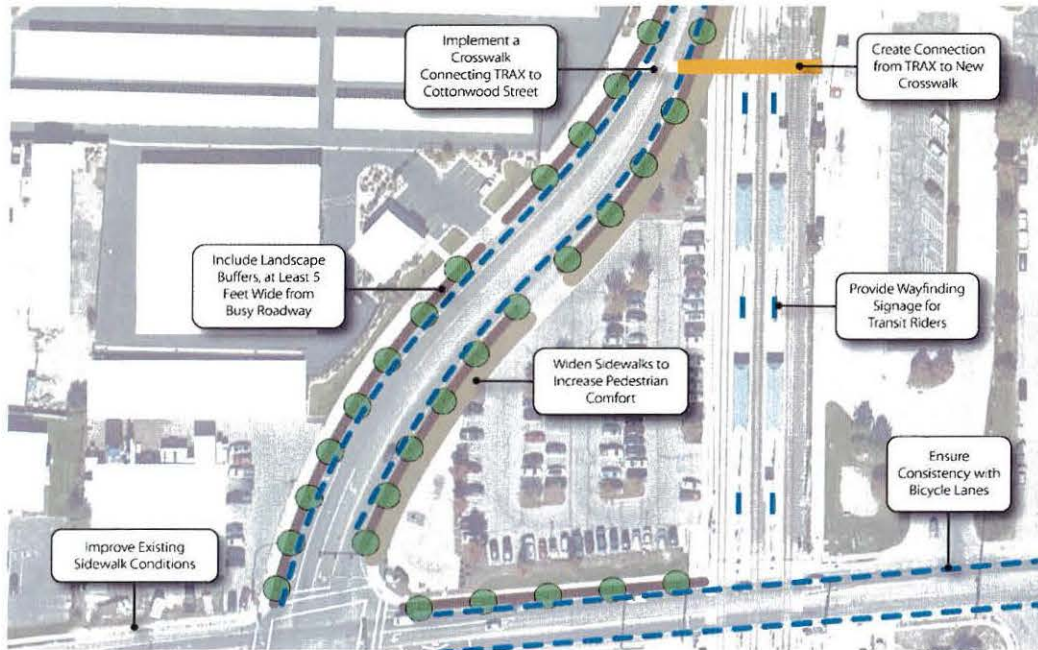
The existing access to the Fashion Place West TRAX station is inadequate. Future improvements to the station should include improving access from Cottonwood Street as well as across Winchester Street.
